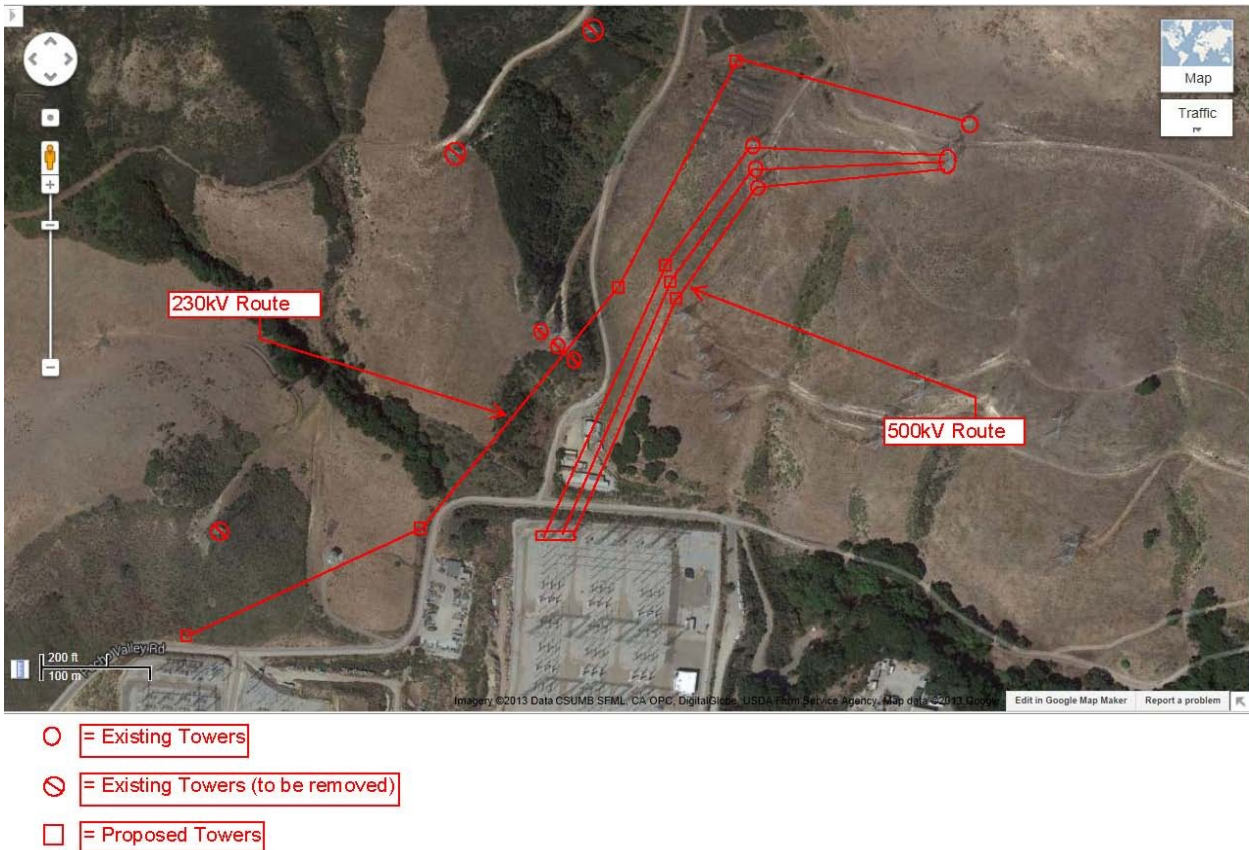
Existing 230 kV and 500 kV Power Line Rerouting
